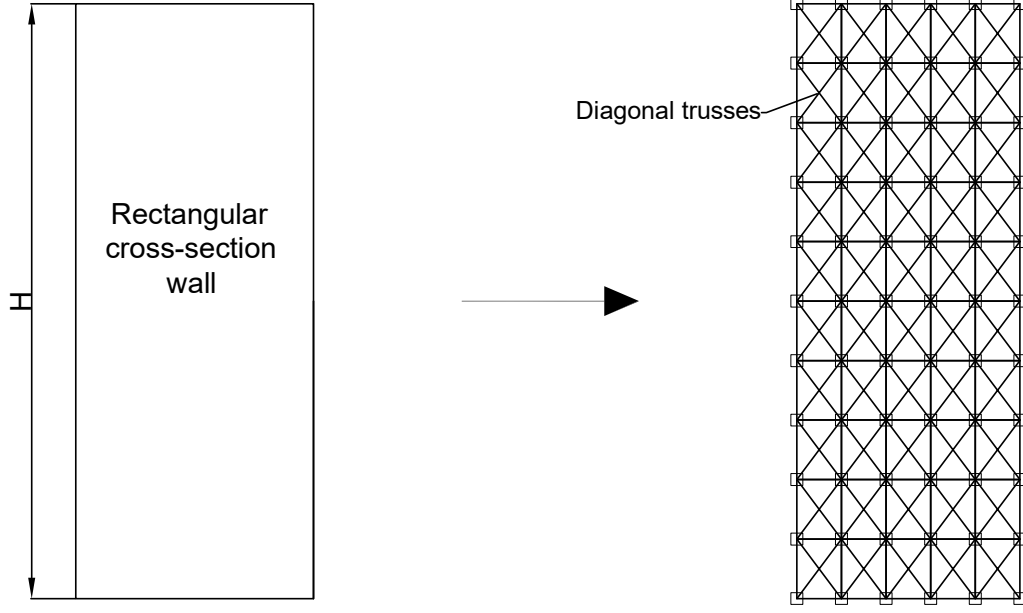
Beam-Truss model of a rectangular cross-section wall like G10
